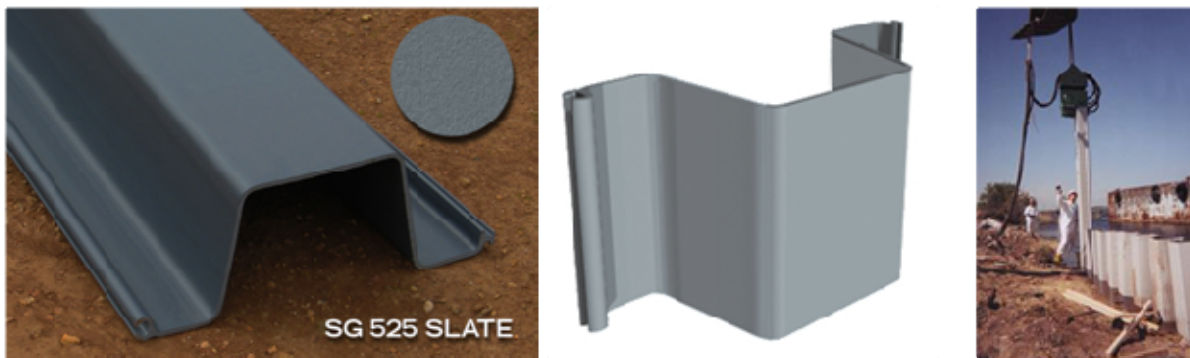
Example of the metal sheet piling. Both the material and the construction is expensive.
